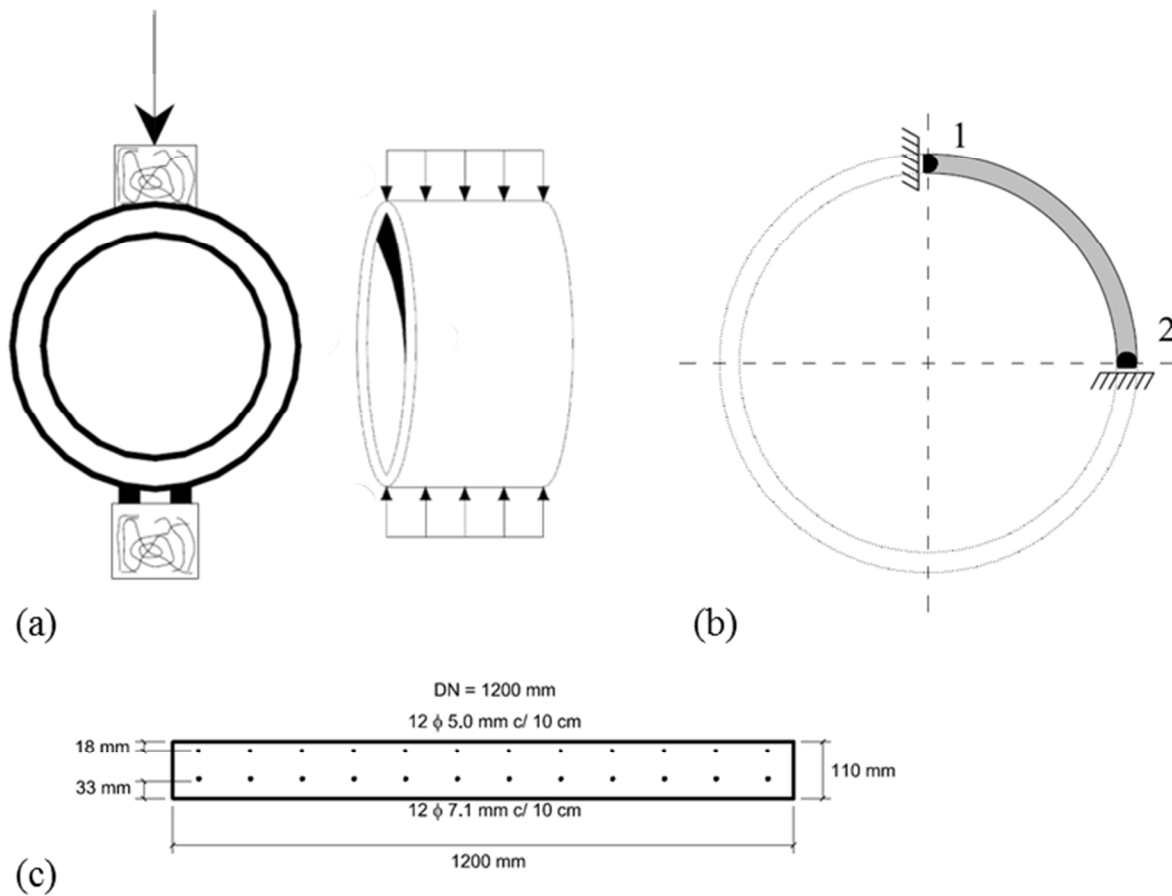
(a) Set-up of a test on a reinforced concrete tube (SILVA, 2011); (b) Adopted mesh; (c) Tube cross section.
